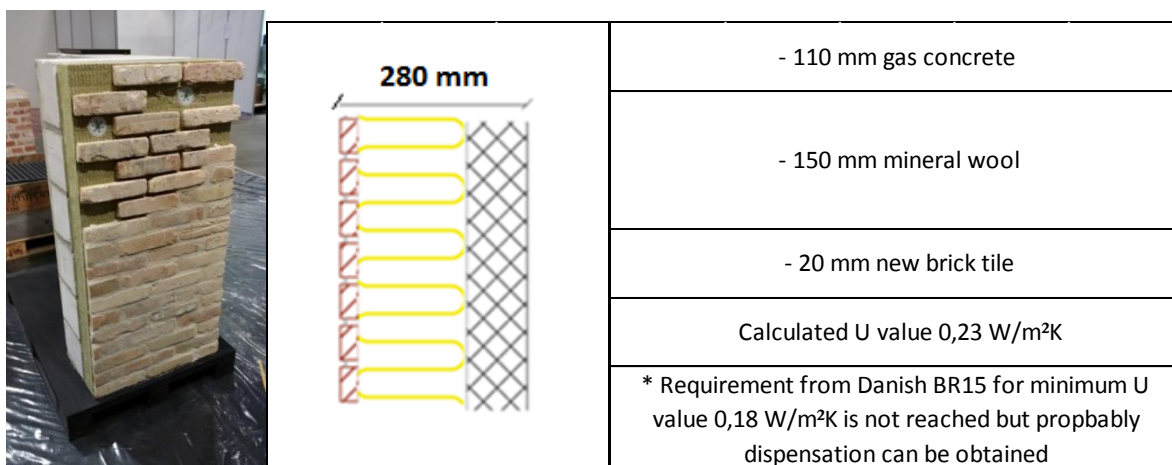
Demolition of external brick work, new thicker insulation and brick tiles- solution does not require additional foundation but might require lintels.
